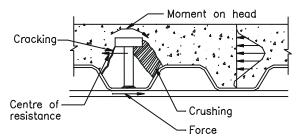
Behaviour of a shear connection fixed through profile sheeting
